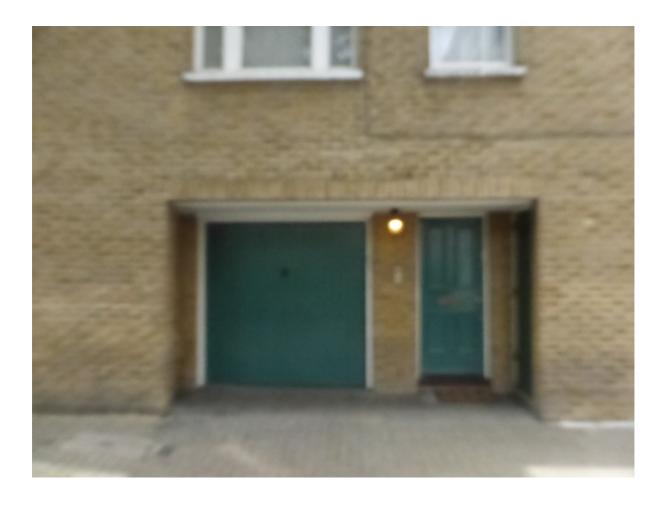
Proposed new garage design to kitchen enclosure as garage door with top window New main door
